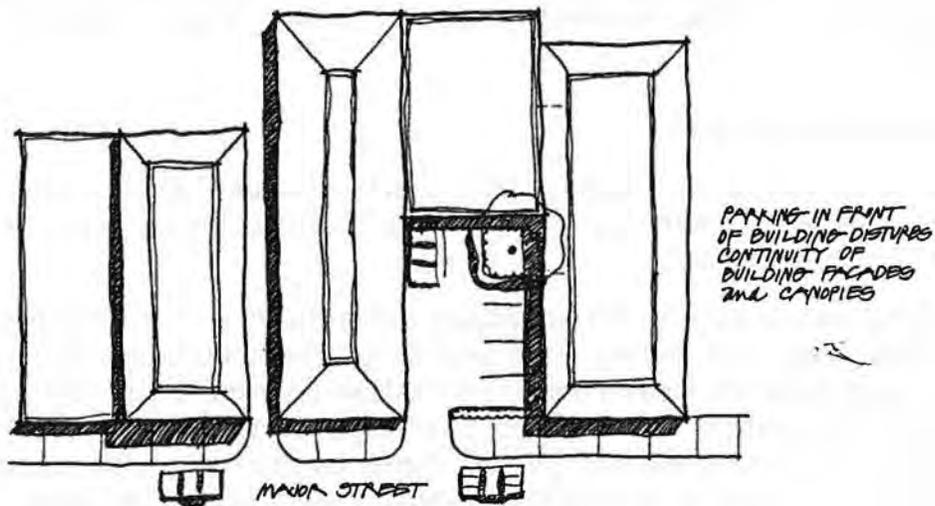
ON SITE PARKING AT FRONT OF LOT
